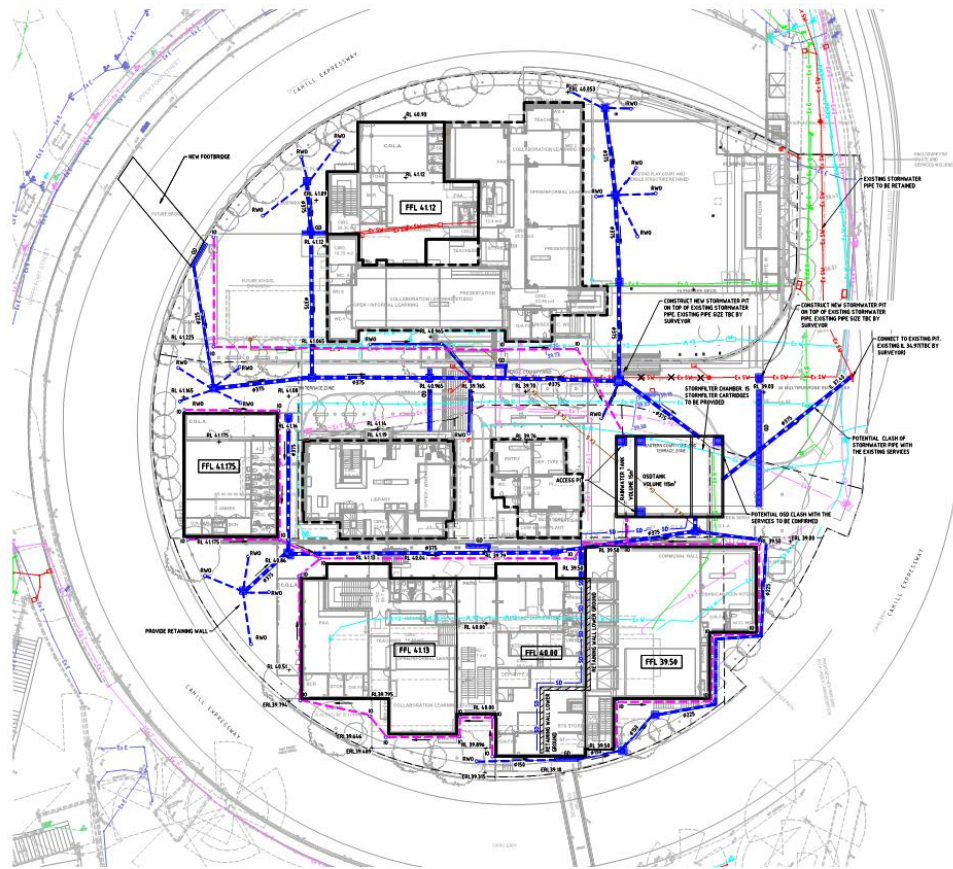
Schematic Stormwater Layout (Based on the architectural plans dated 06.12.19)
